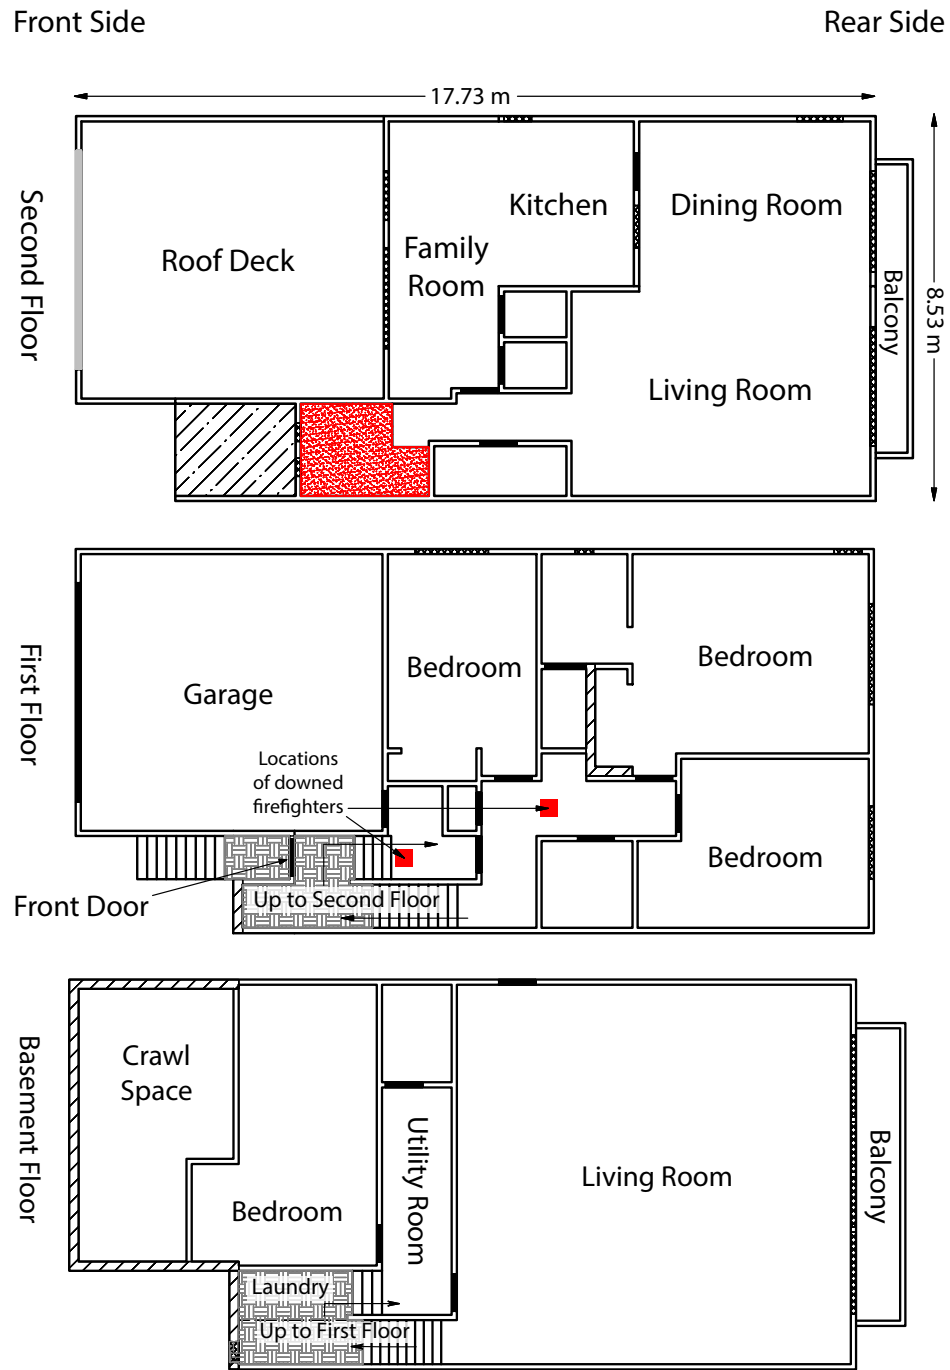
Plan view of the second floor (top), first floor (middle), and basement floor (bottom). The fire originated in the living room on the basement floor. Stairs and rooms are identified using information collected by NIST. The sub-basement level was not connected to the other three levels of the house and is not shown.
